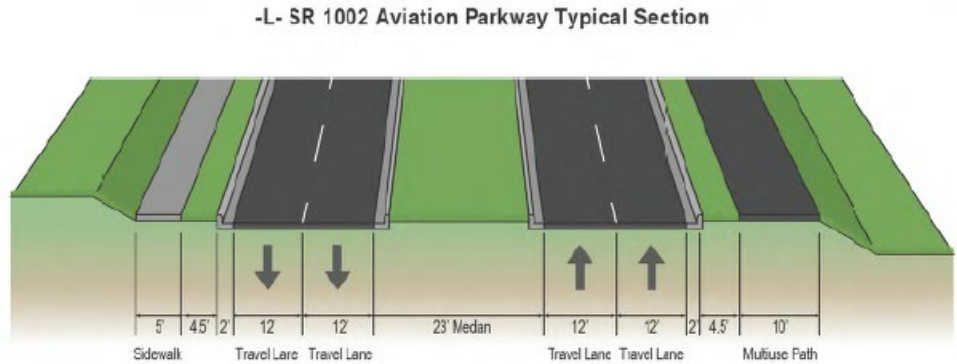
U-5811 Expected Cross-Section for Aviation Parkway (NCDOT)
